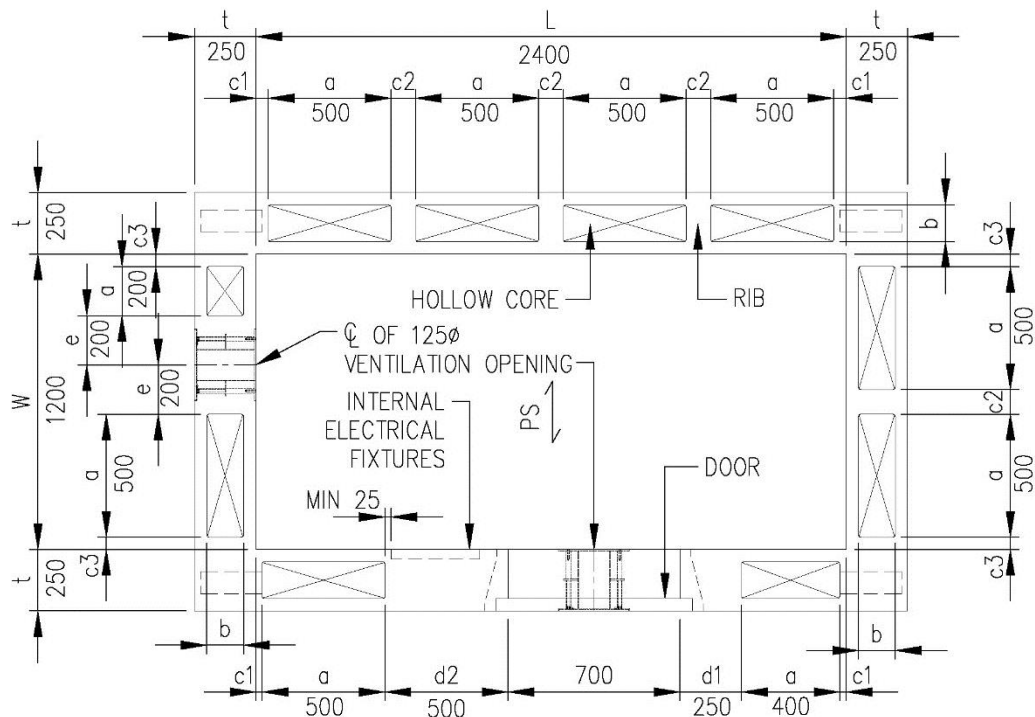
(i). PRECAST HS WITH HS DOOR ON LONGER WALL AND ONE OF THE VENTILATION SLEEVE ABOVE THE DOOR (TYPE 1)
